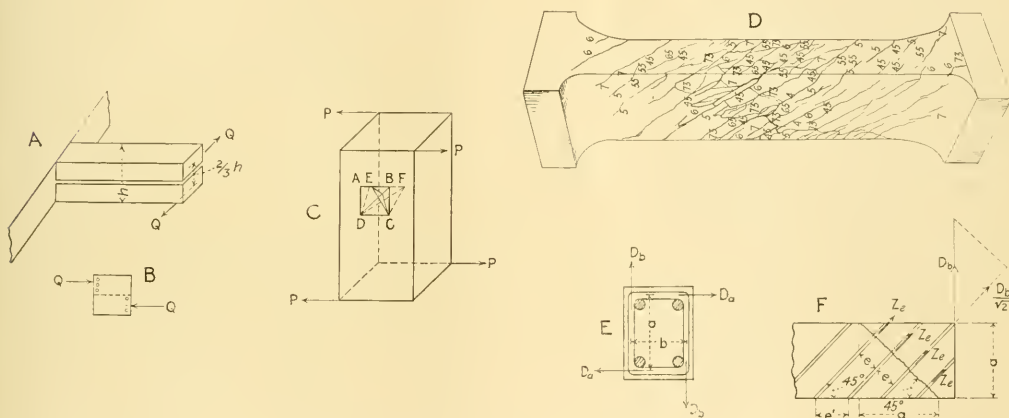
REINFORCED CONCRETE BEAMS IN TORSION
